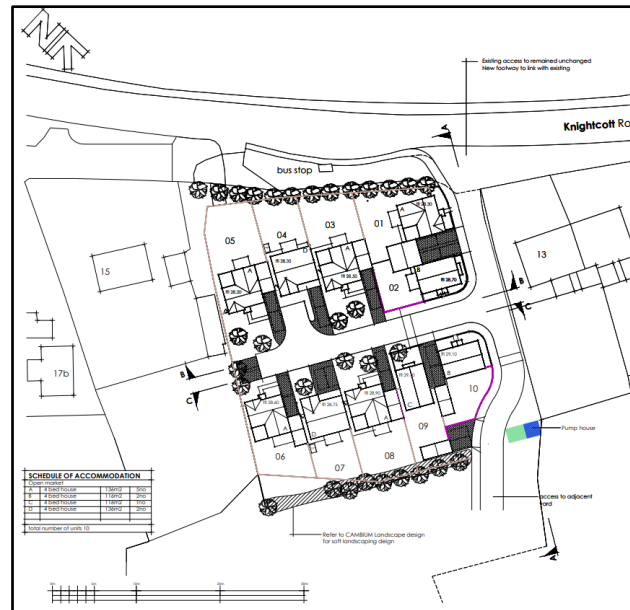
Extract taken from 20/P/0600/MMA PROPOSED SITE PLAN 020 REV B
